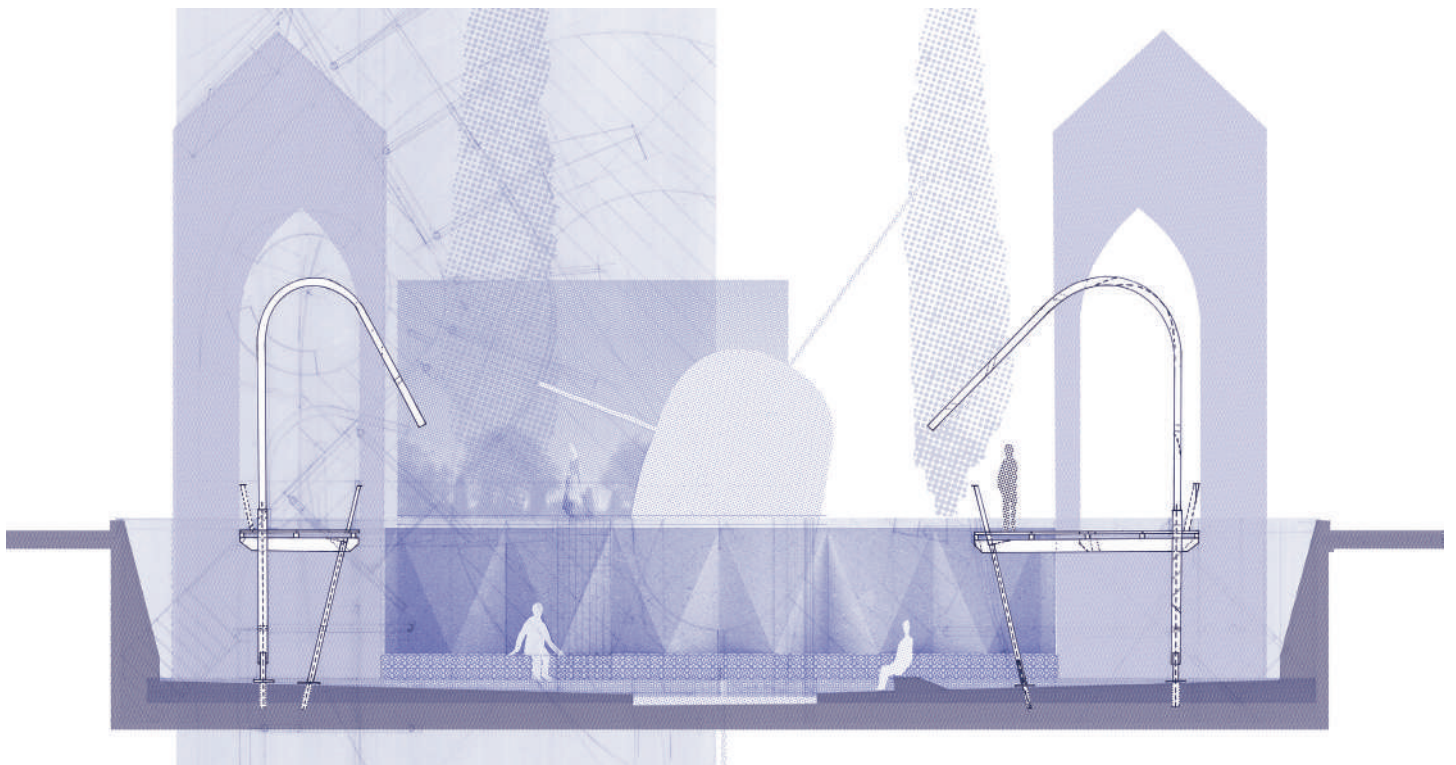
Overlay of cross-section and plan of proposed intervention. Ink on velum and digital collage.
